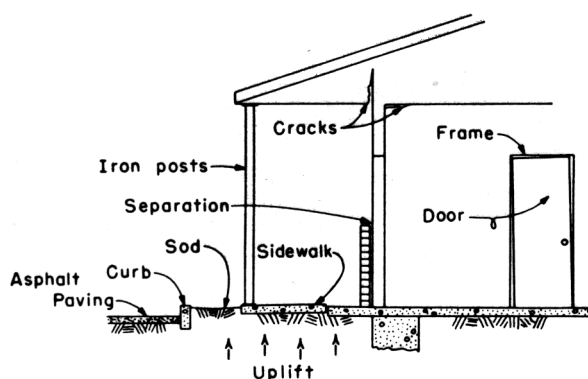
Damage caused to building by uplift of expansive clay foundation.
